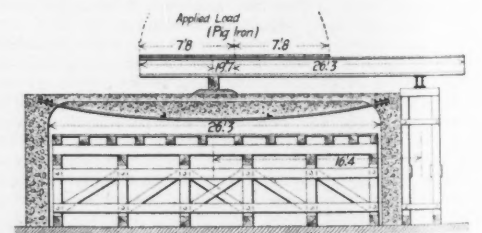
Sketch Showing Method of Testing and Construction of Moeller Floor System.
